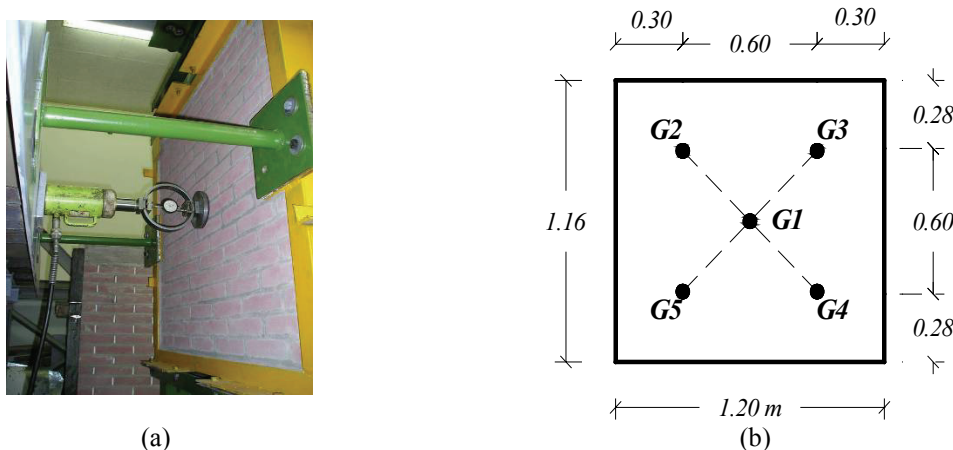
(a) Test setup (b) position of mechanical gauges in the out-of-plane bending tests
